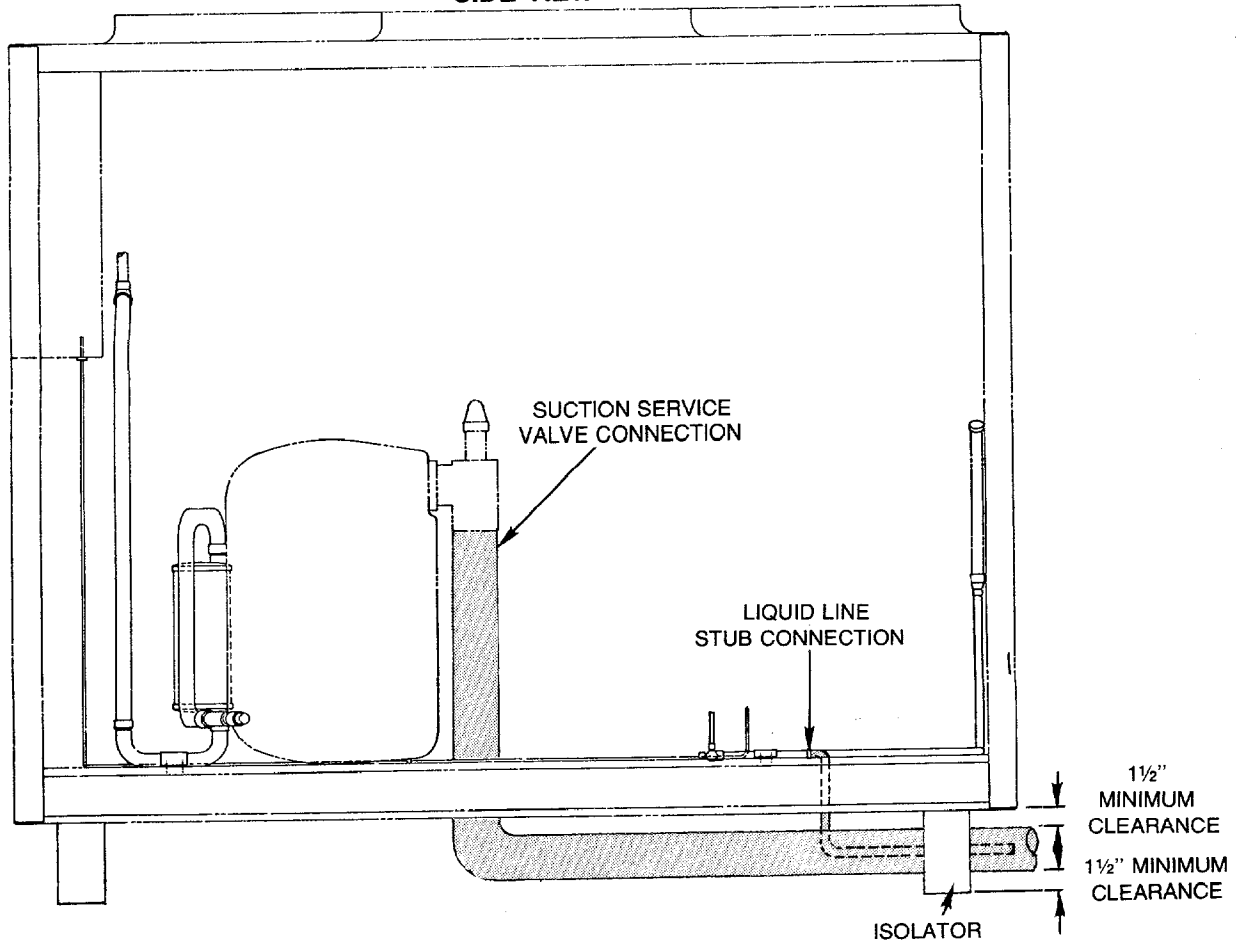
Piping Installation: 20 Through 30-Ton Units With Isolators
